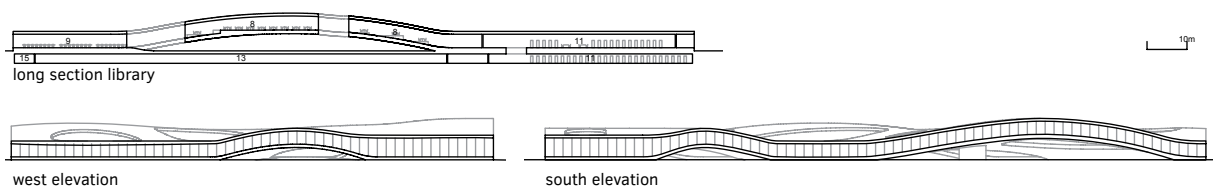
Learning Centre sections and elevations 1:1'000 (SANAA 2010)
